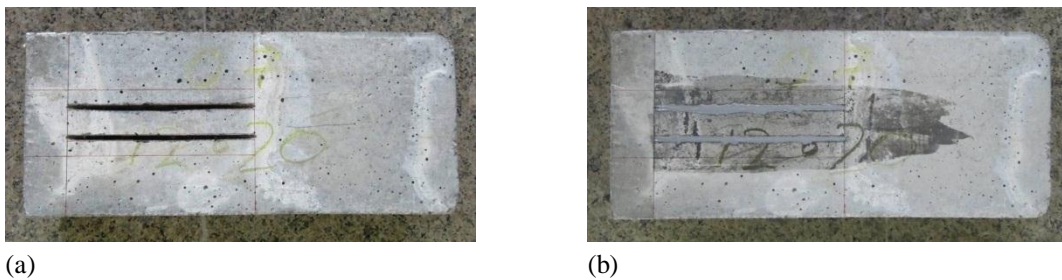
EBROG technique; a) cutting longitudinal grooves; b) filling the grooves using epoxy adhesive.
